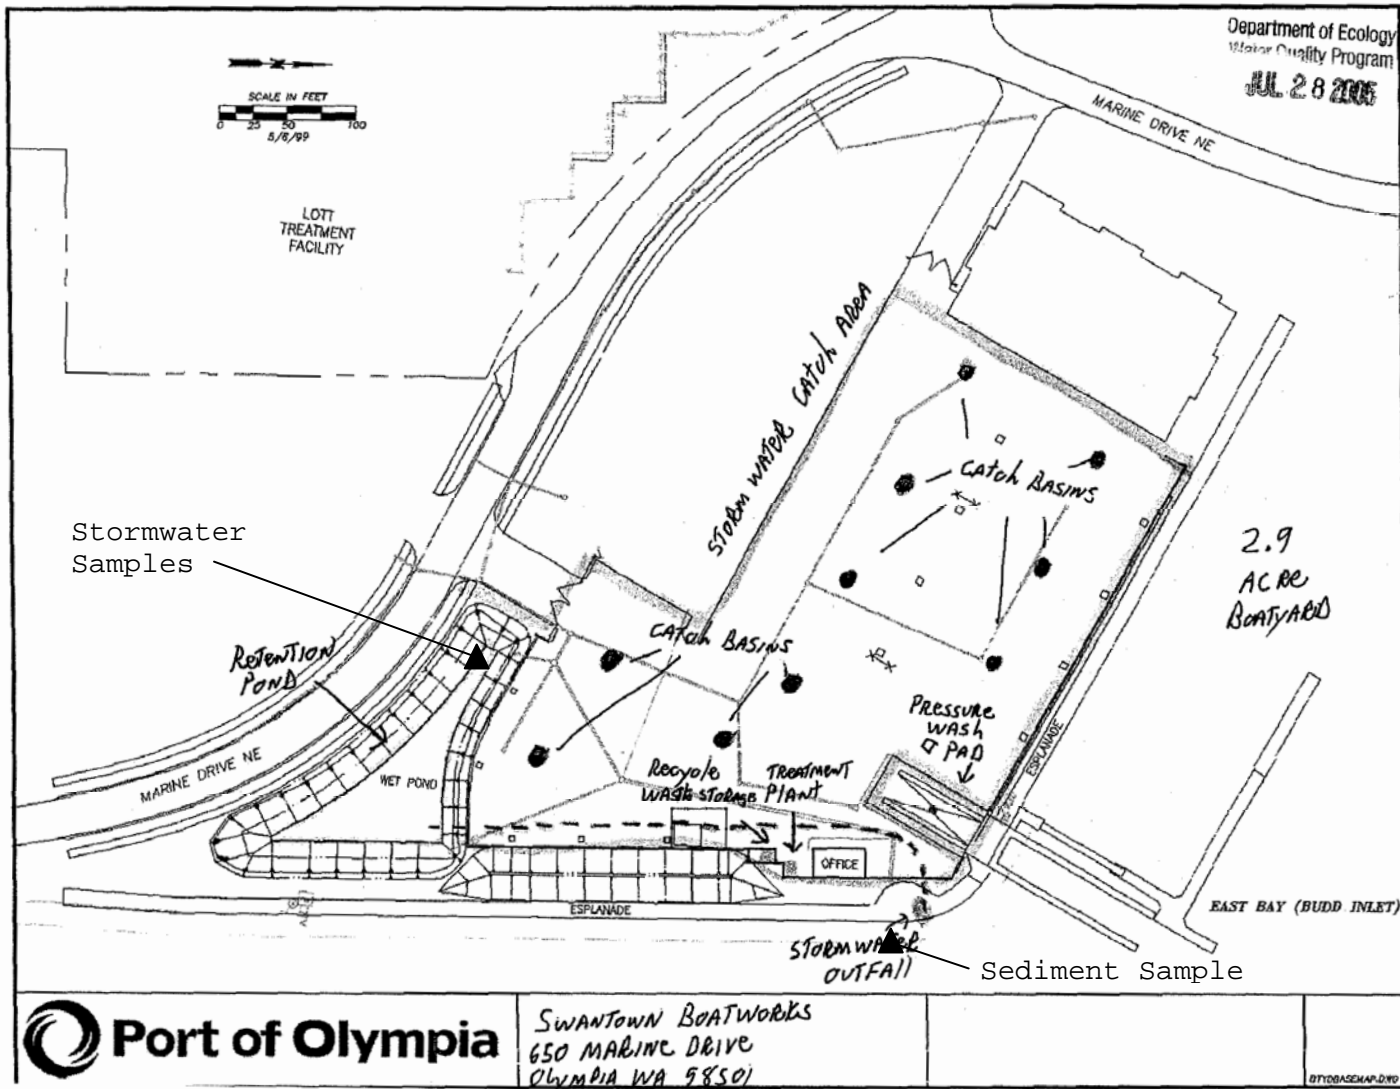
Swantown Boatworks Showing Location of Ecology's 2006 Stormwater Runoff and Sediment Samples.
